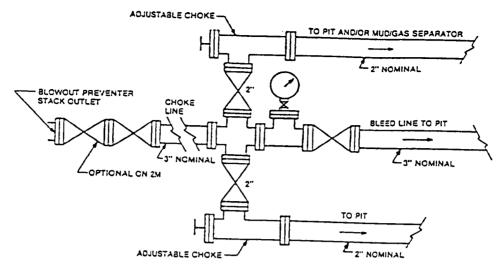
Typical choke manifold assembly for 2M and 3M rated working pressure service — surface installation.
